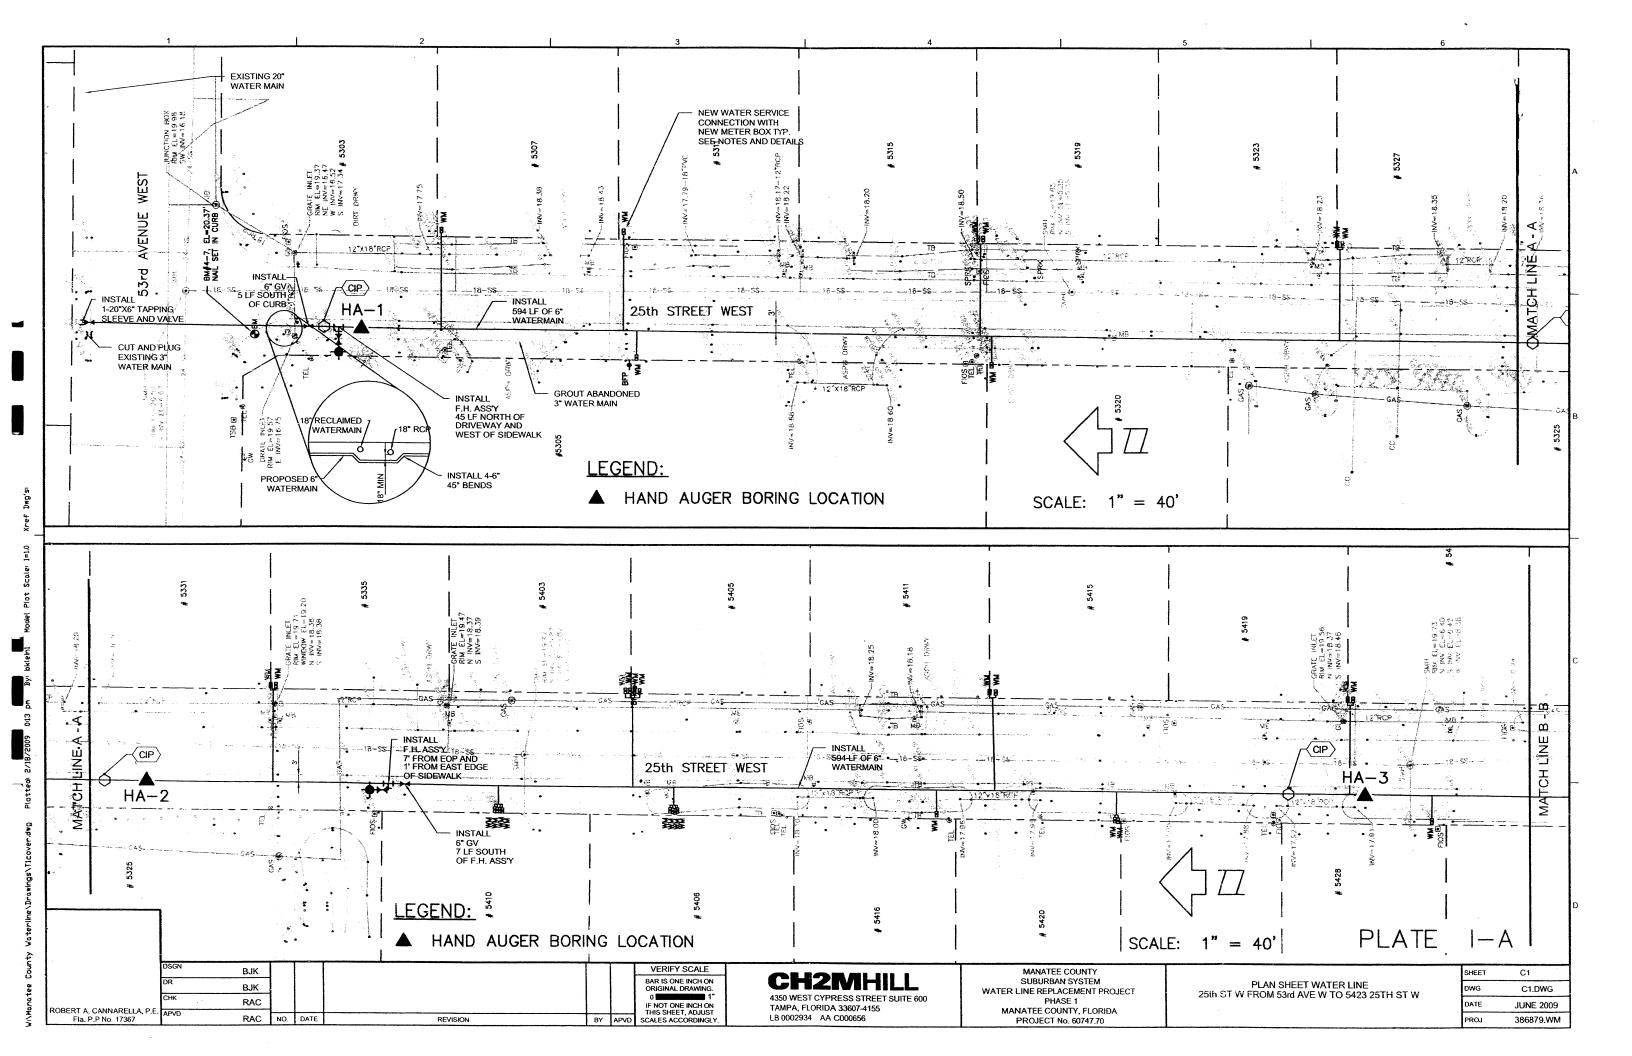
### PLATES I-A THROUGH 1-R - TEST BORING LOCATION PLANS
